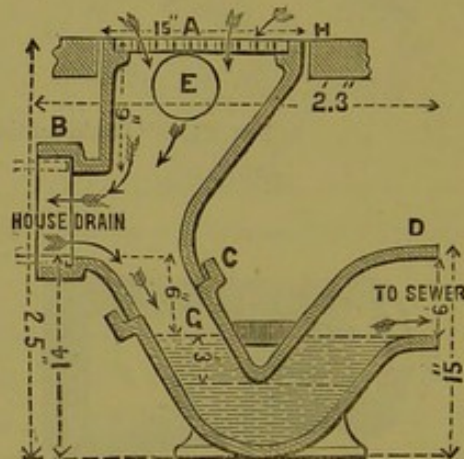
Vertical Section of a 6-in. "Ventilating Drain-syphon," &c.
